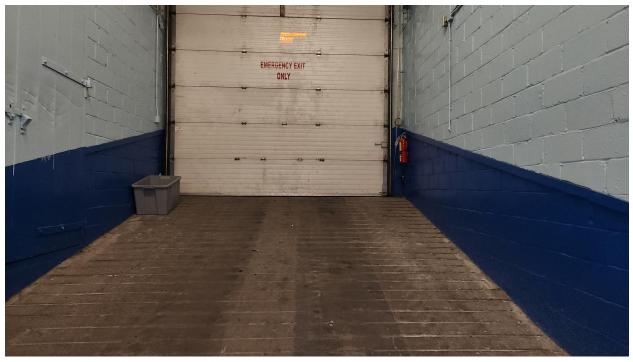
Suspended concrete slab over mechanical room (c.1951).
